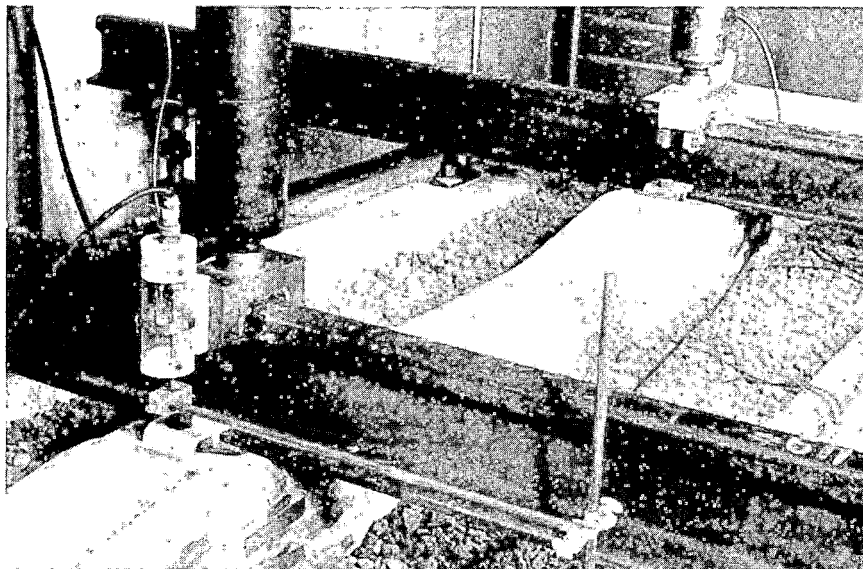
GENERAL VIEW OF TIE TEST ON BALLAST
